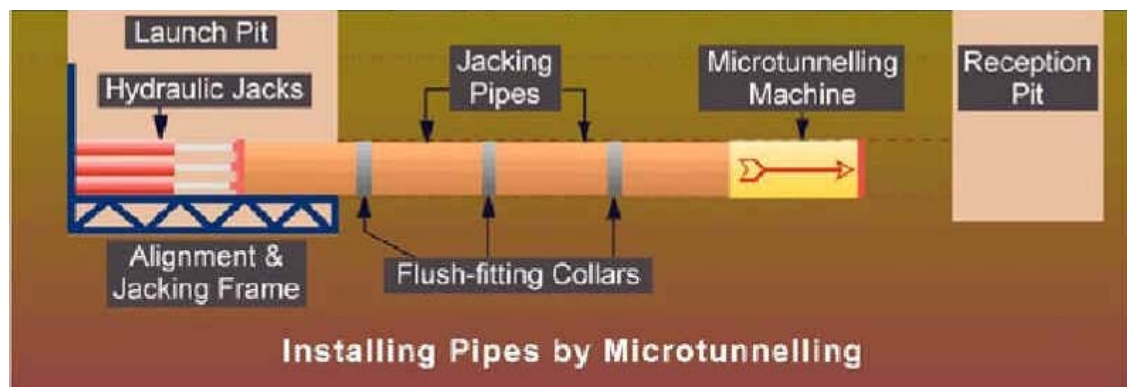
TYPICAL ARRANGEMENT OF MICROTUNNELLING METHOD
